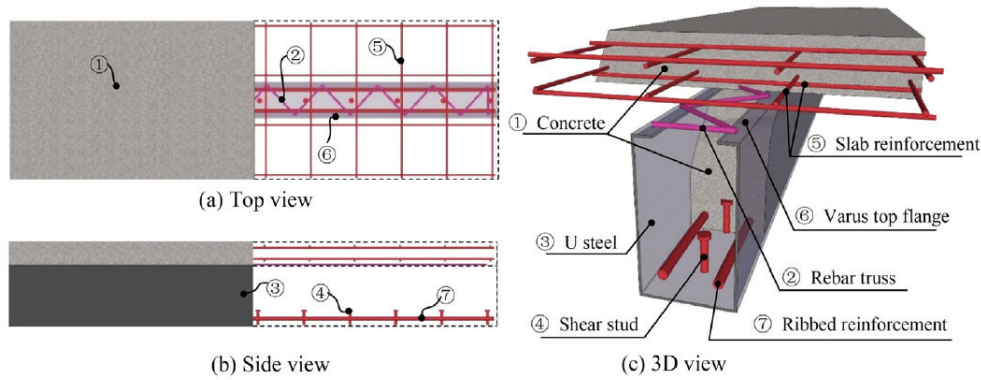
RCUCB beam details (Liu et al., 2018)
